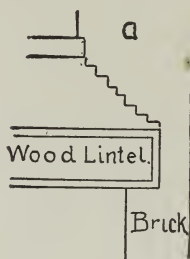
Cracks in Brick Wall Caused by Shrinkage of Wood Lintel.
